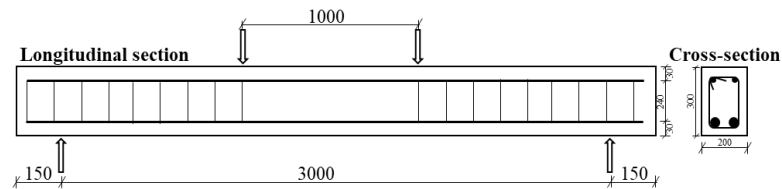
Reinforcement details of ISO30-1 beam (Benmokrane et al. (1995))
